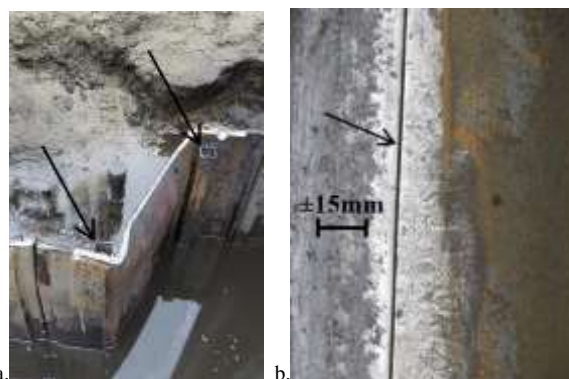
(a) Steel reservation tubes welded on a sheet pile prior to its installation. (b) Narrow incision in a sheet pile in which the FBG sensor array is embedded.
